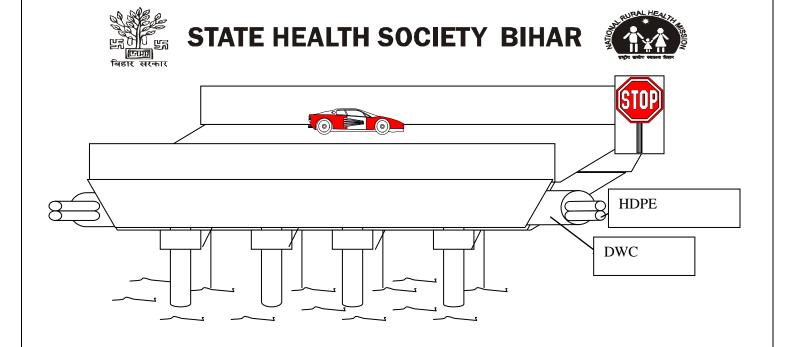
OFC LAYING ON PERMANENT BRIDGE
